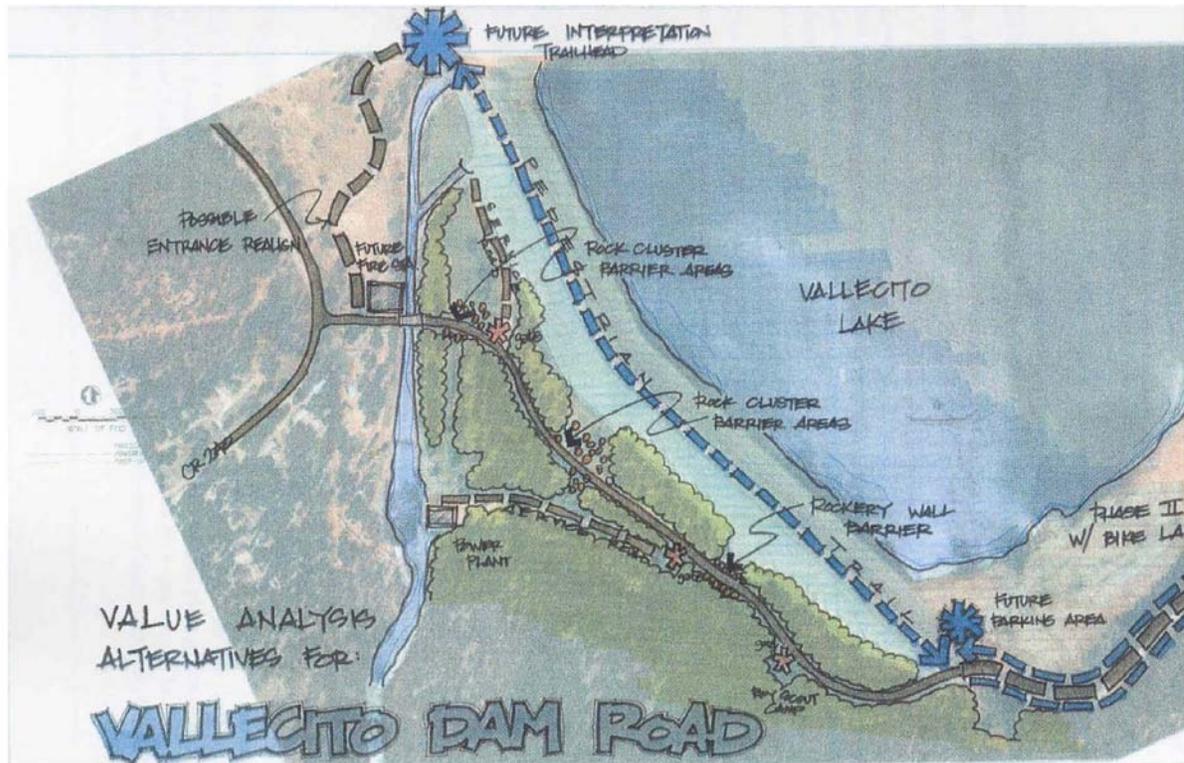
Artist conception, Proposed Alternative also showing the existing Vallecito Dam Road as a trail.
